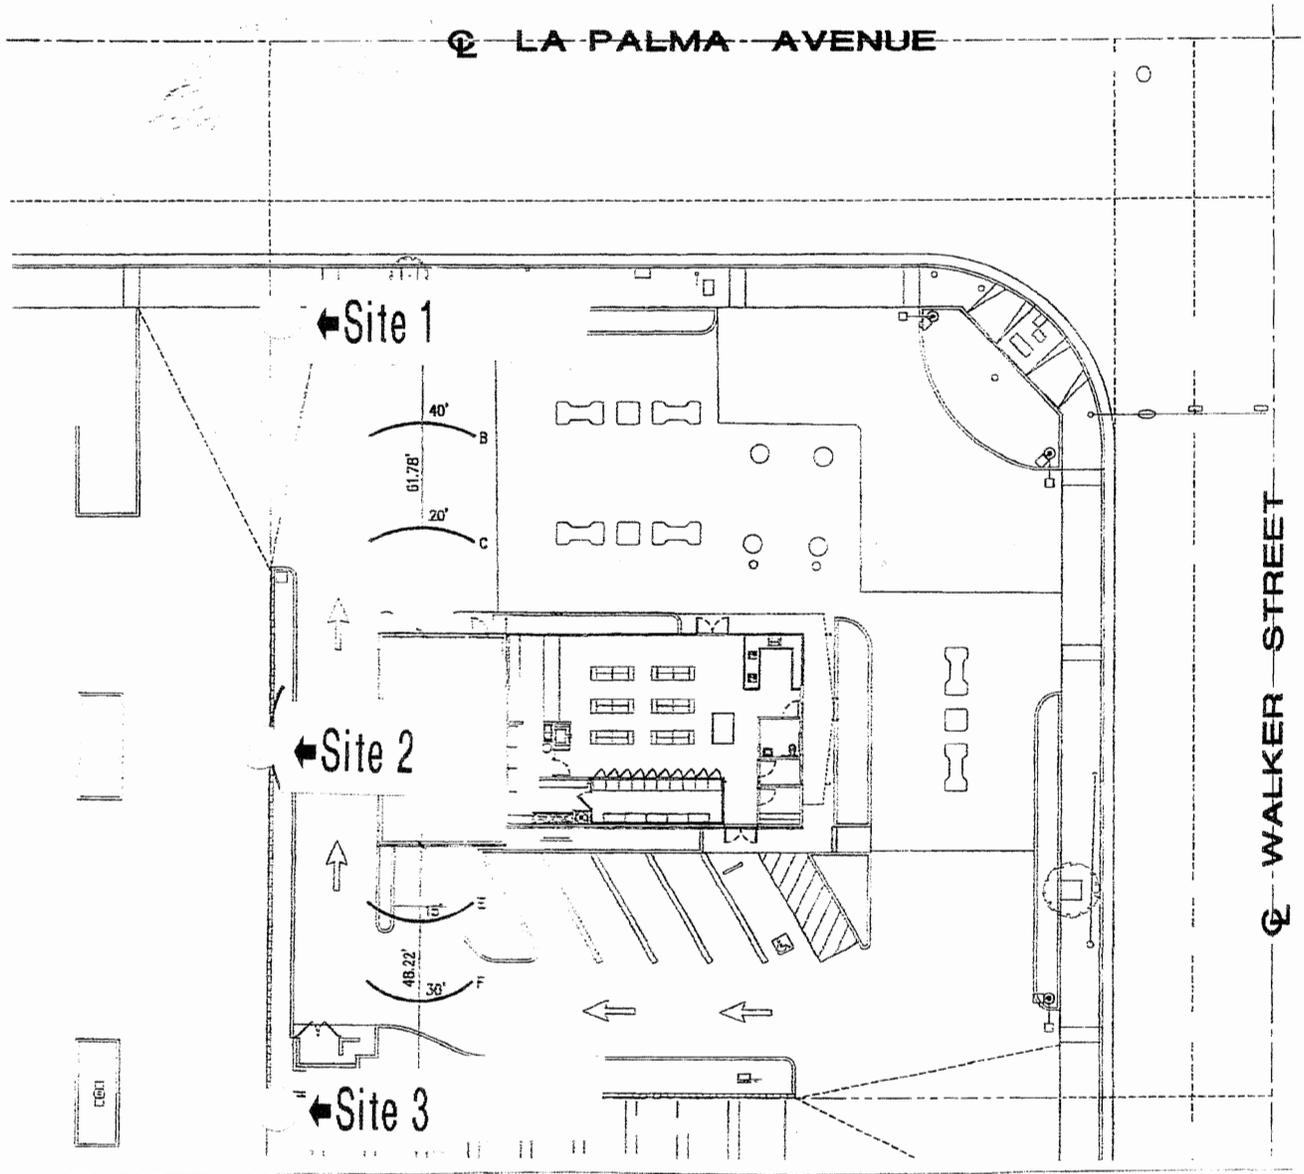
Site Plan Showing Post-Construction Noise Measurement Locations-Sites 1, 2 and 3
